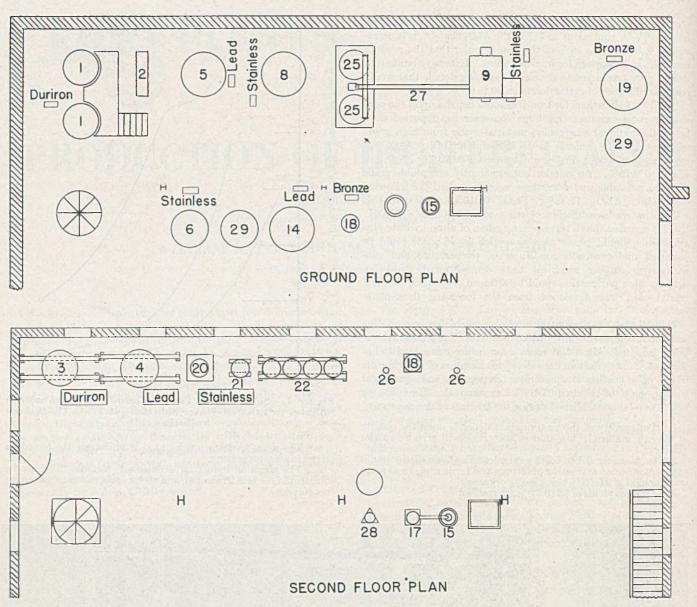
Ground Floor and Second Floor Plans of Equipment Layout in Continuous Pilot Plant
